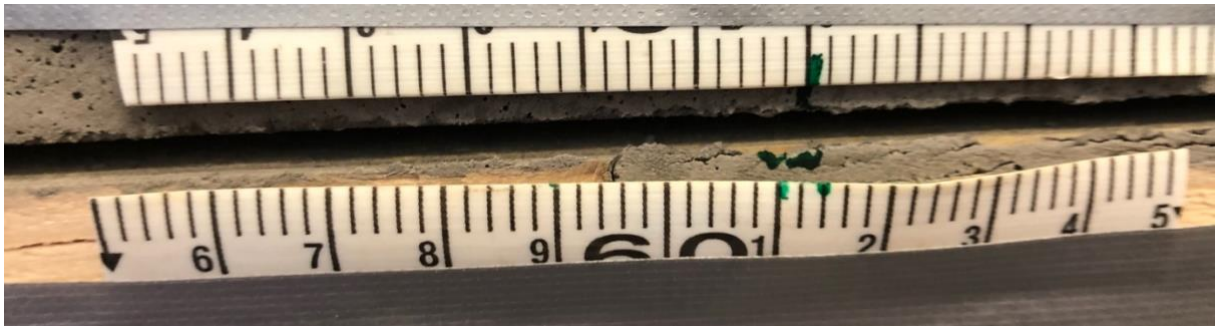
Movement in concrete and timber for Slab B5 at edge
